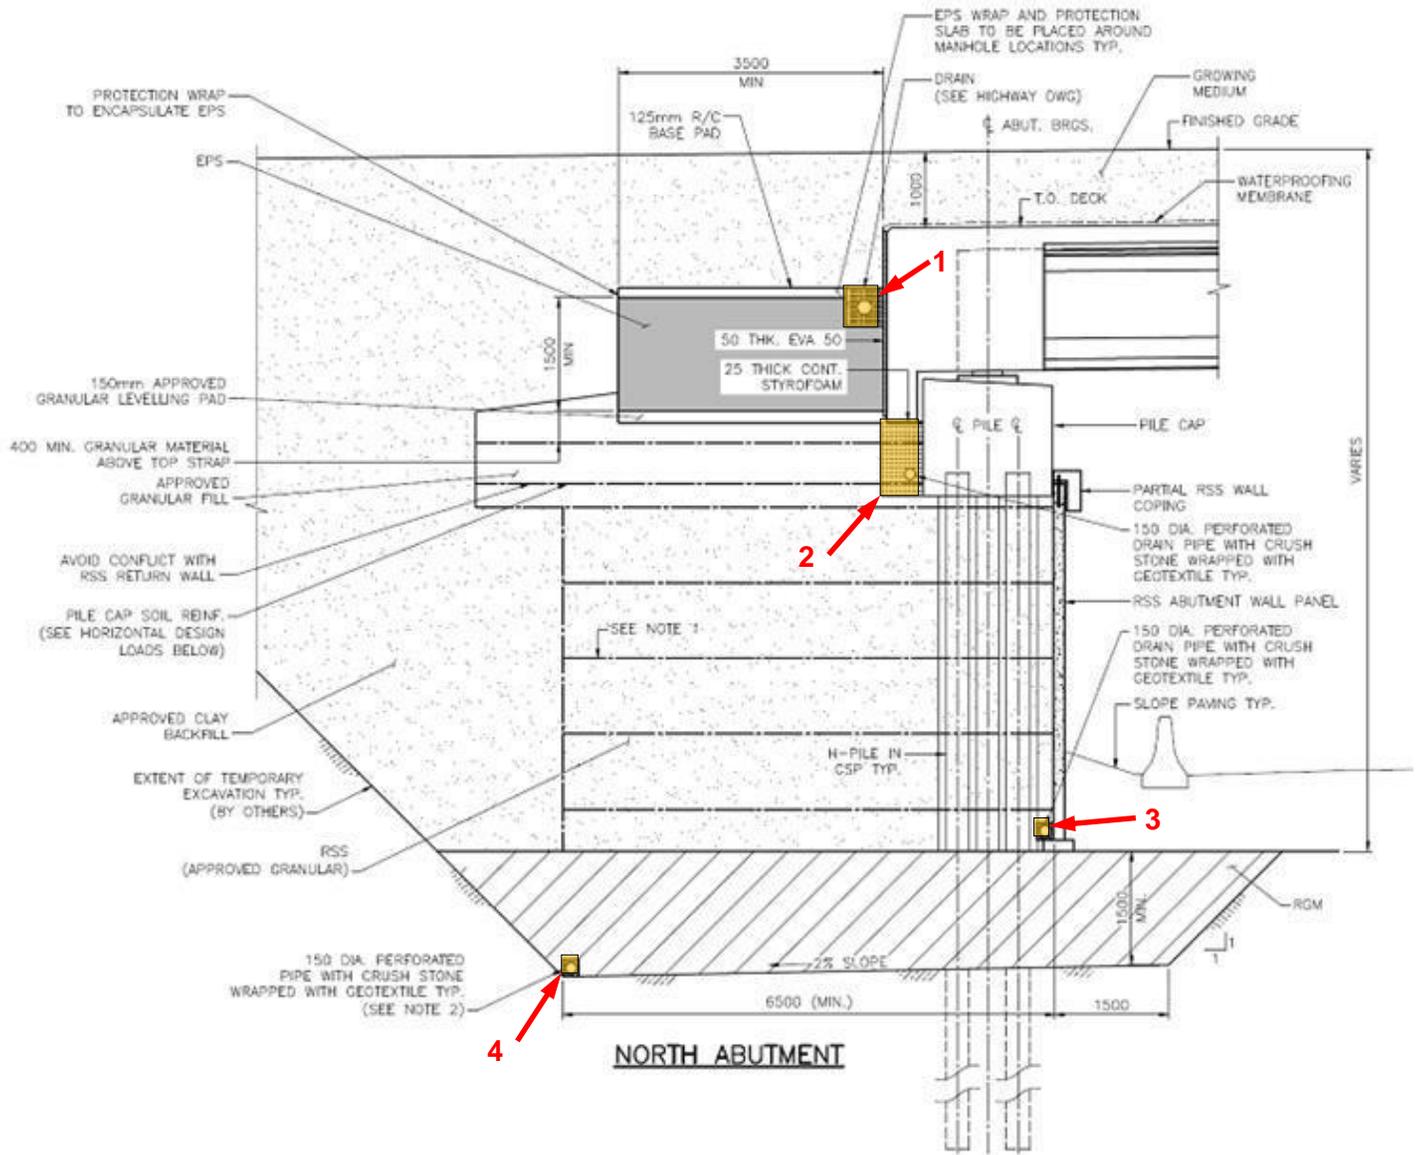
Drains in a typical WEP tunnel abutment (extract from Structures design submission)
